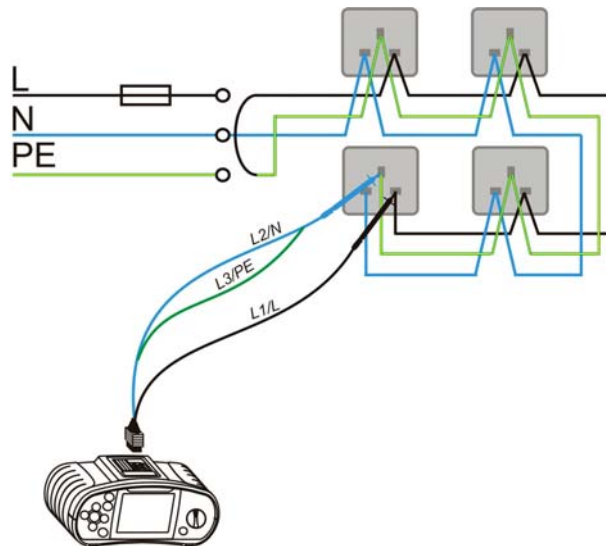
Connection for testing the R1+R2 section of the wiring
